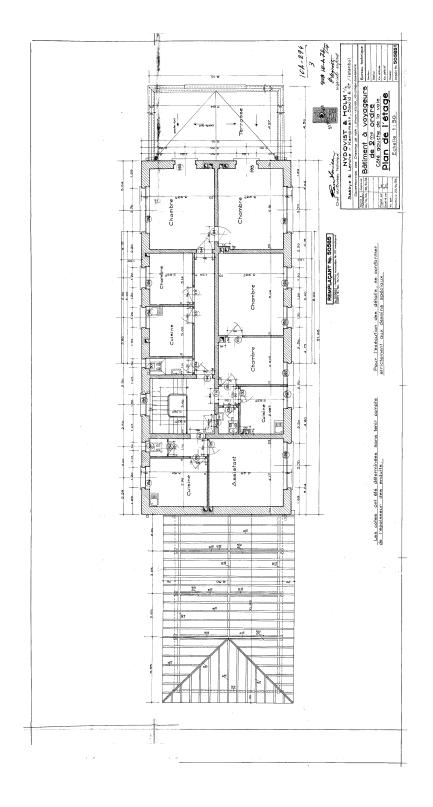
NYDQVIST-HOLM Company IInd Class project / First floor plan
